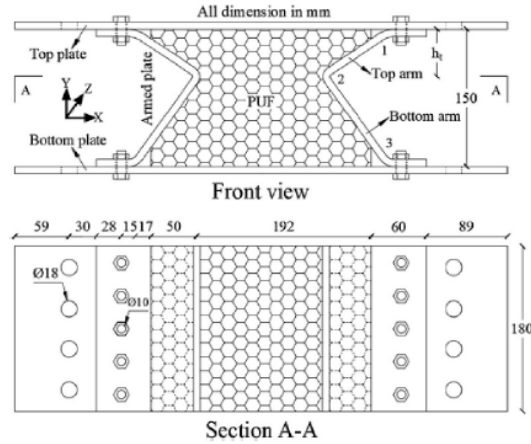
Front and section view of EAC specimen (Wang et al. 2019)
